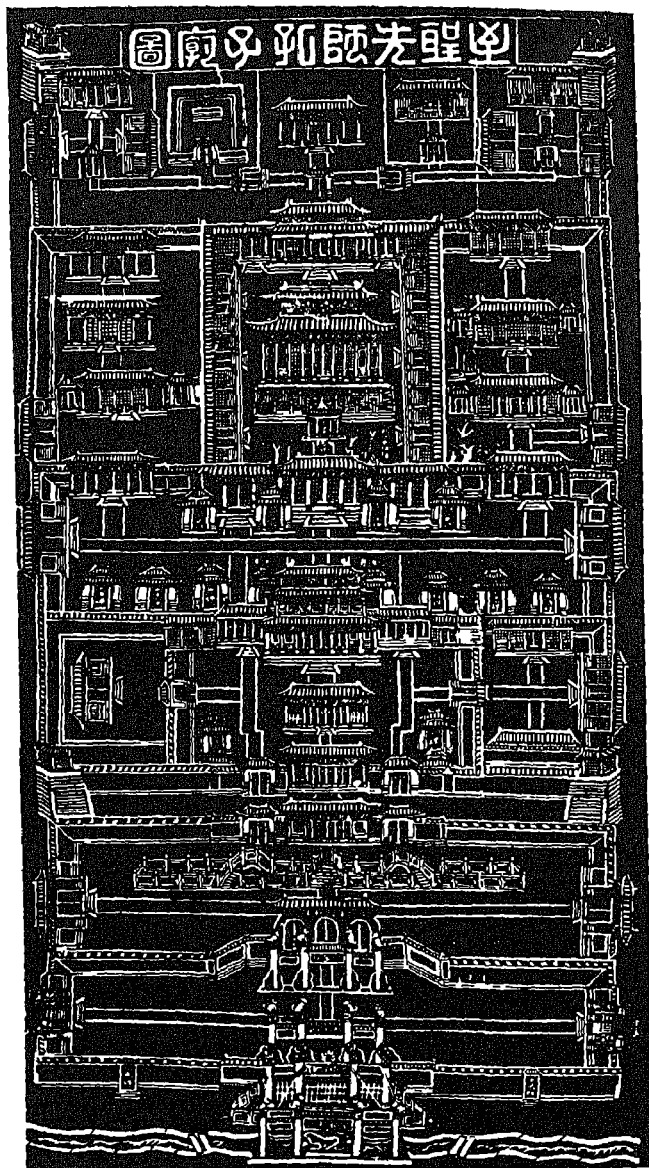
Pictorial plan of the Confucian Temple at Chu Fou, Shantung
